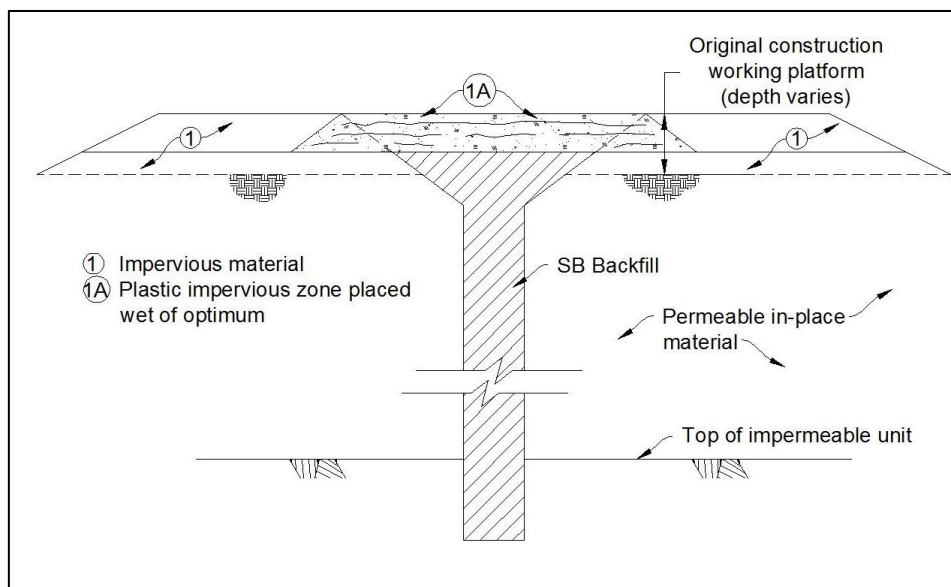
Typical earth backfill/embankment connection detail.
